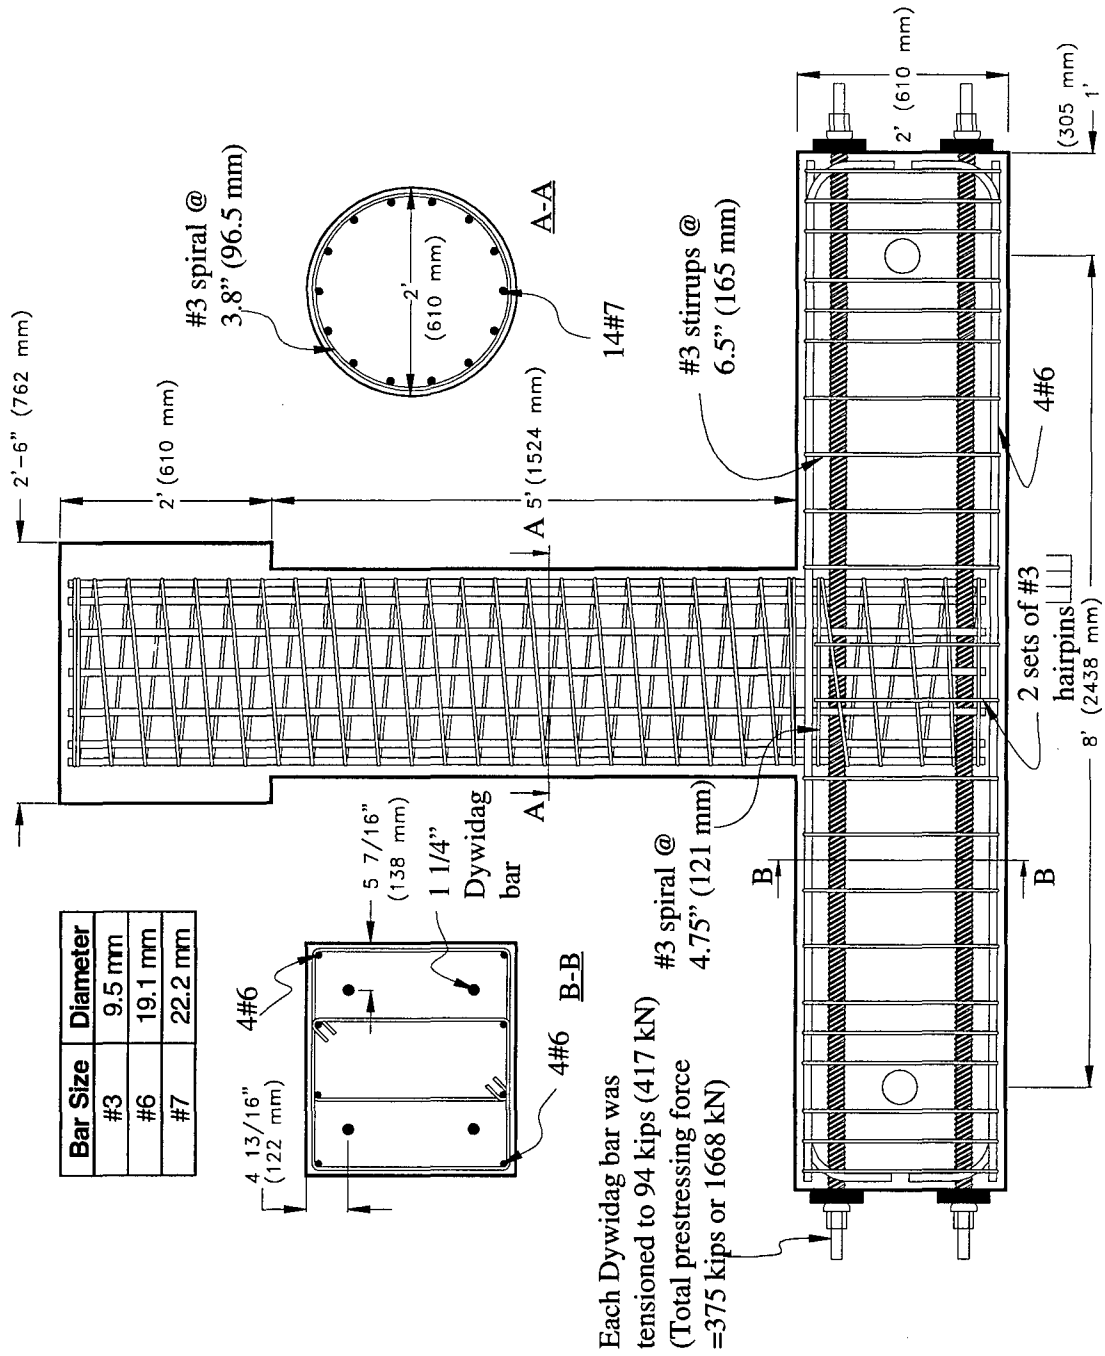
Reinforcement details of the test unit with a partially prestressed bent cap.
